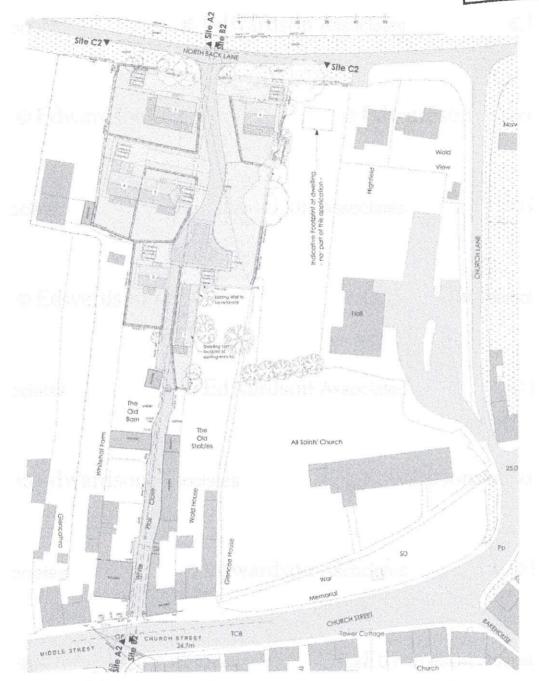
Amended site layout plan (extract from Edwardson Associates drawing 101 REV. A)
